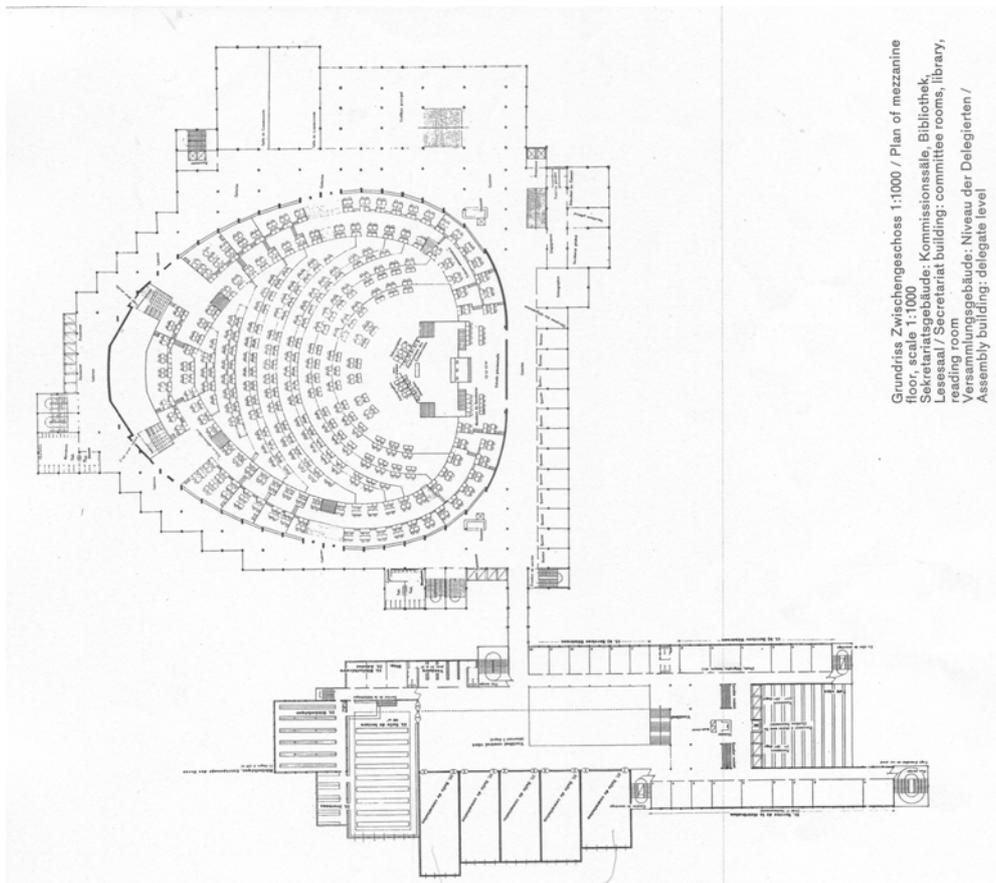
The League of Nations project, Hannes Meyer- Plan of Mezzanine Floor
